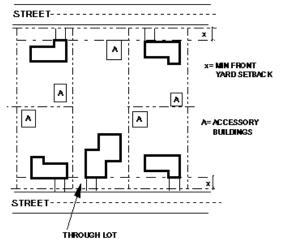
D1e 2-2 Accessory Building Height/Setback
